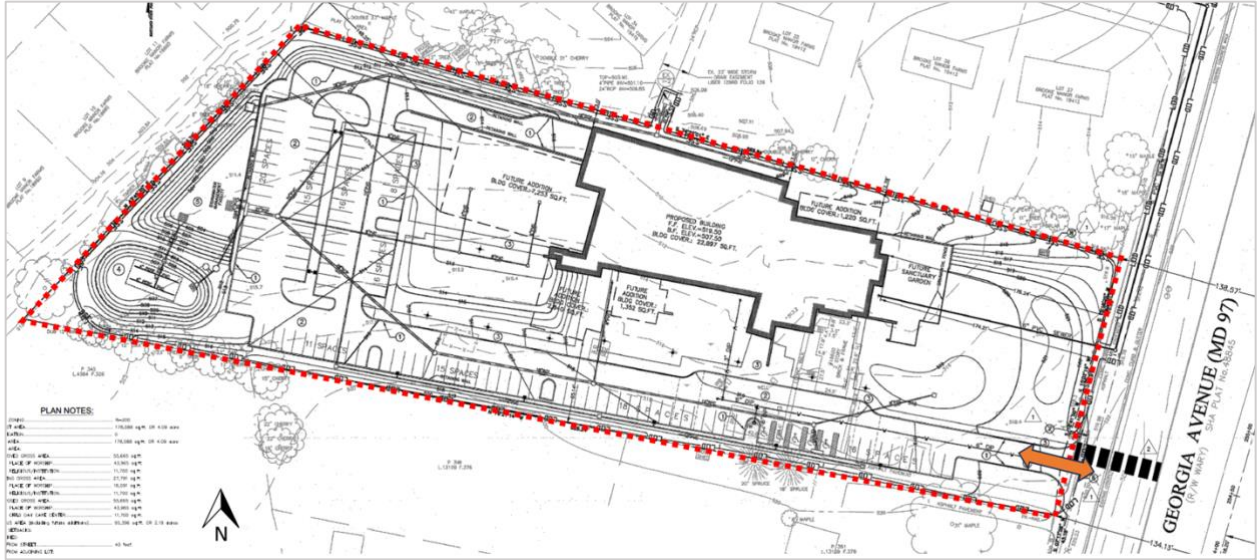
Proposed Preliminary Plan Amendment showing no changes to the existing approved site layout
